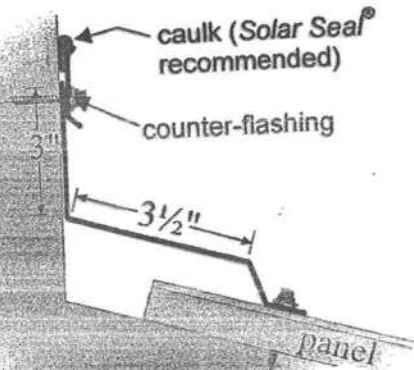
As with the ridge cap, the ENDWALL FLASHING above can be sealed using outside closures.
